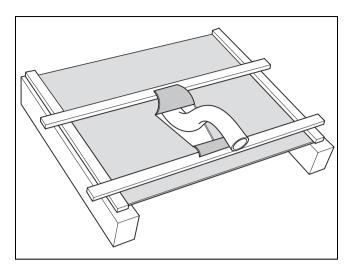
Guiding the pipe through the roofing felt membrane
